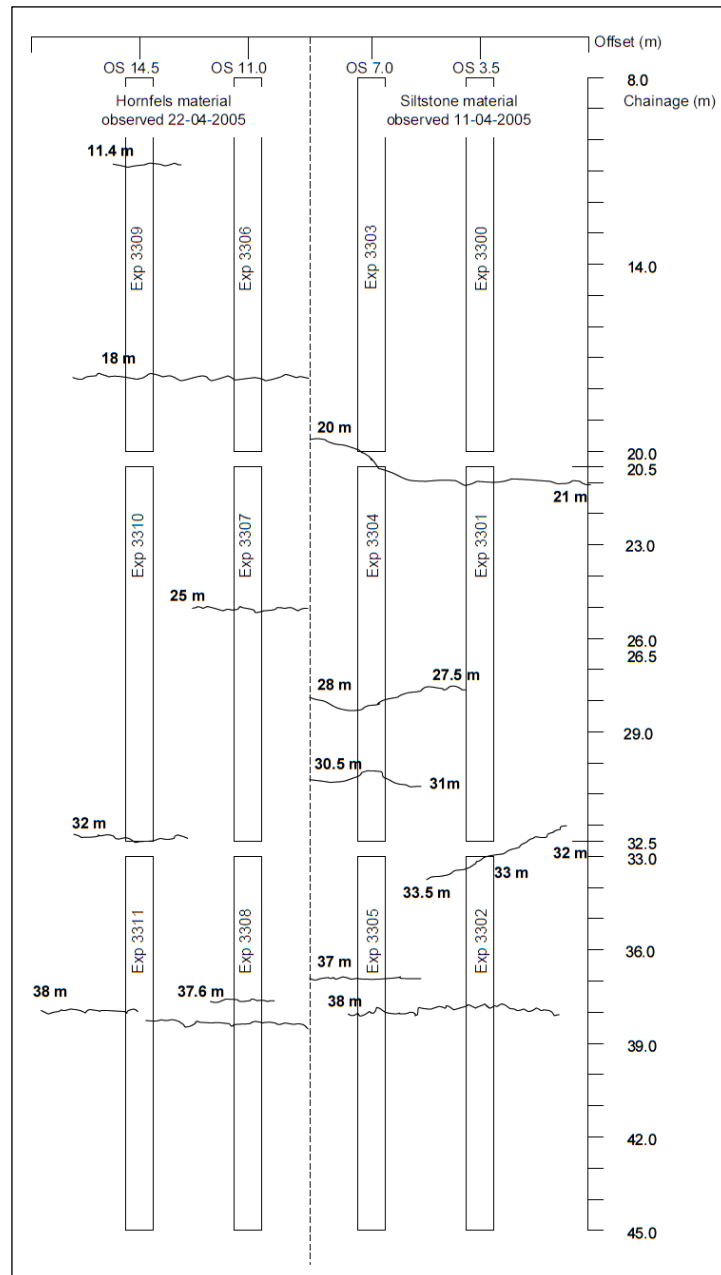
Australian test section layout showing reflective drying shrinkage cracks (17).
